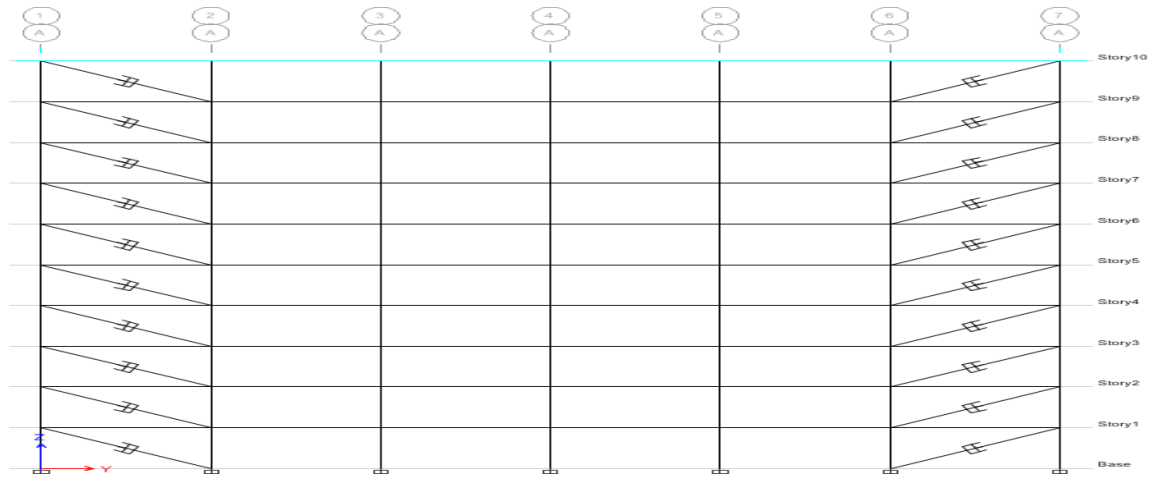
SBSC with FVD at Exterior Corners Elevation.
